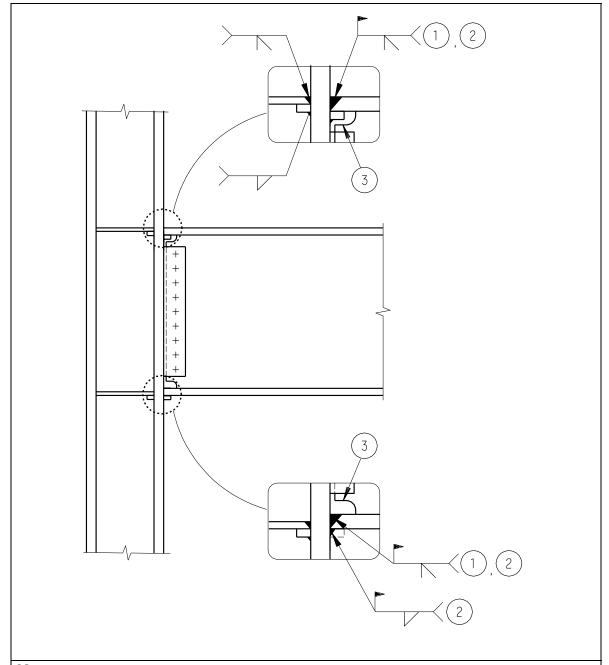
Improved Welded Unreinforced Flange Connection
